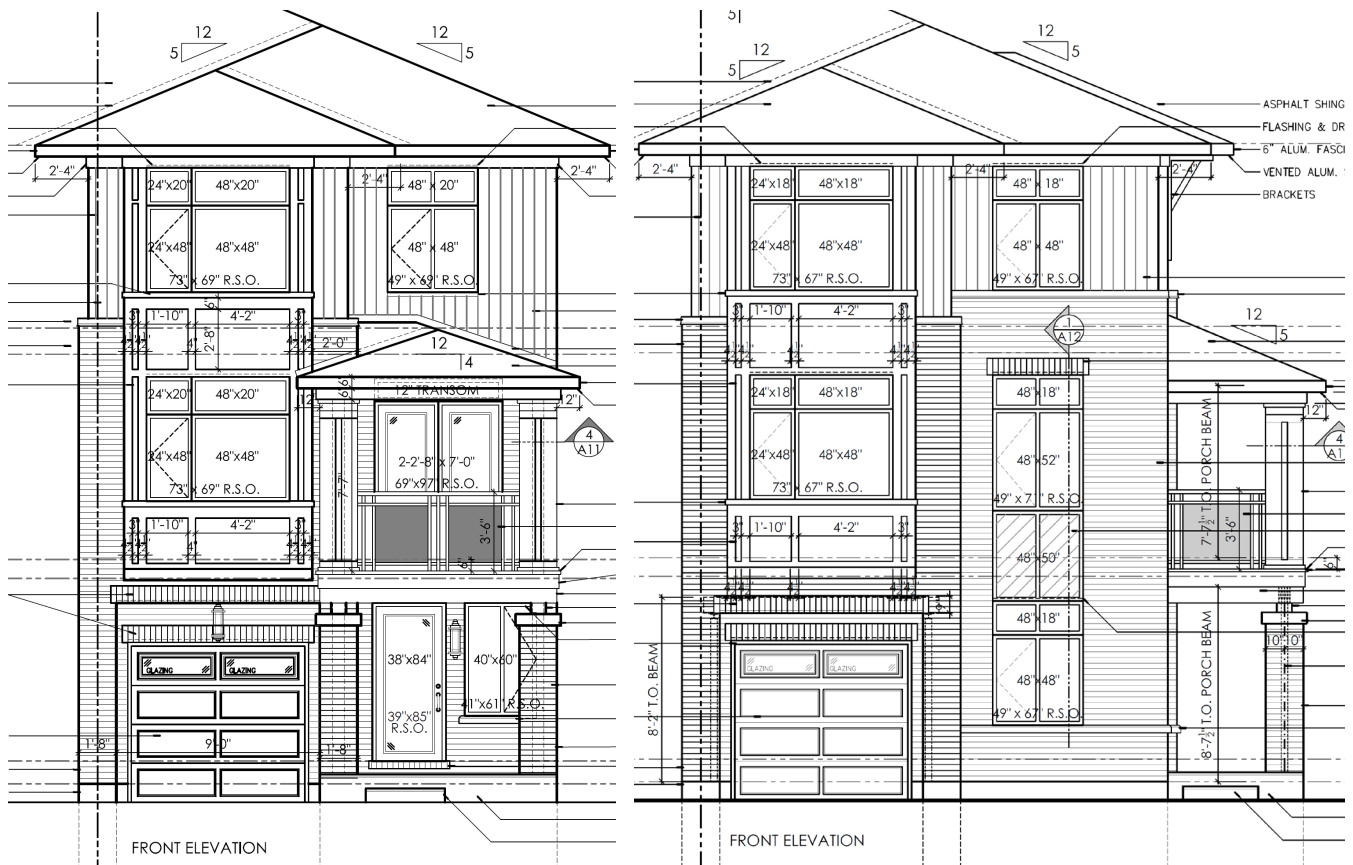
Sample Front Elevations of Interior (left) and Corner (right) Back-to-Back Townhouse Units
